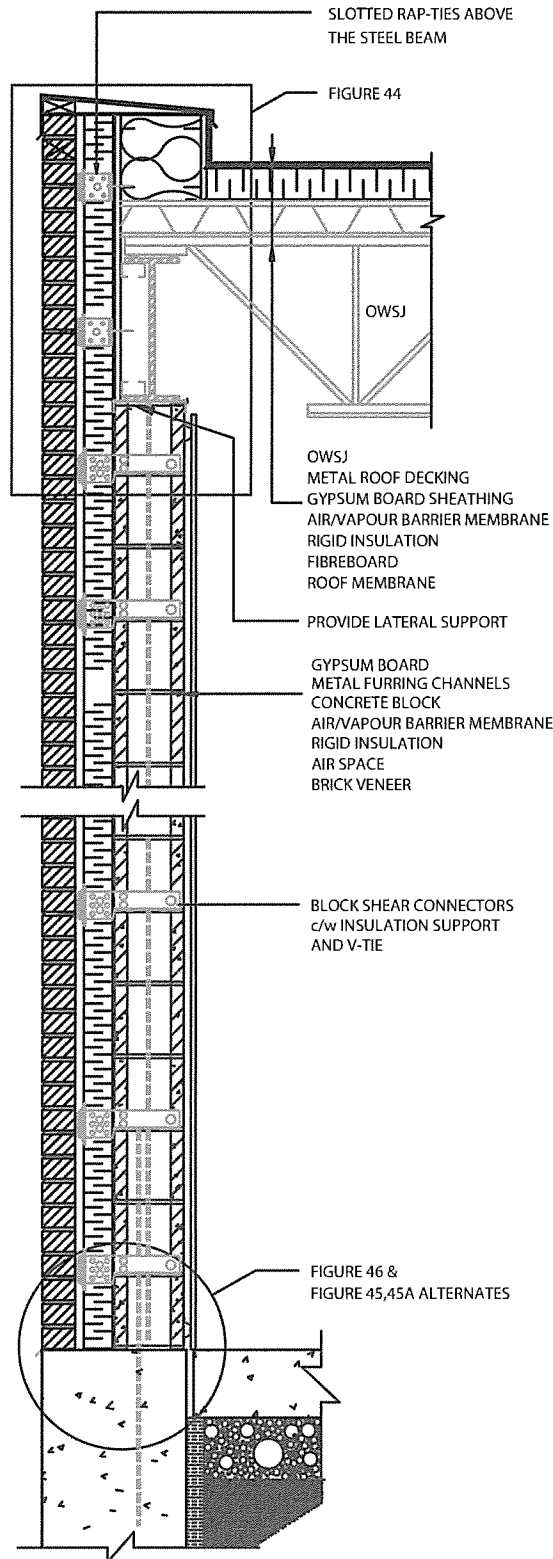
BRICK VENEER / CONCRETE BLOCK - O.W.S.J. CONNECTION
